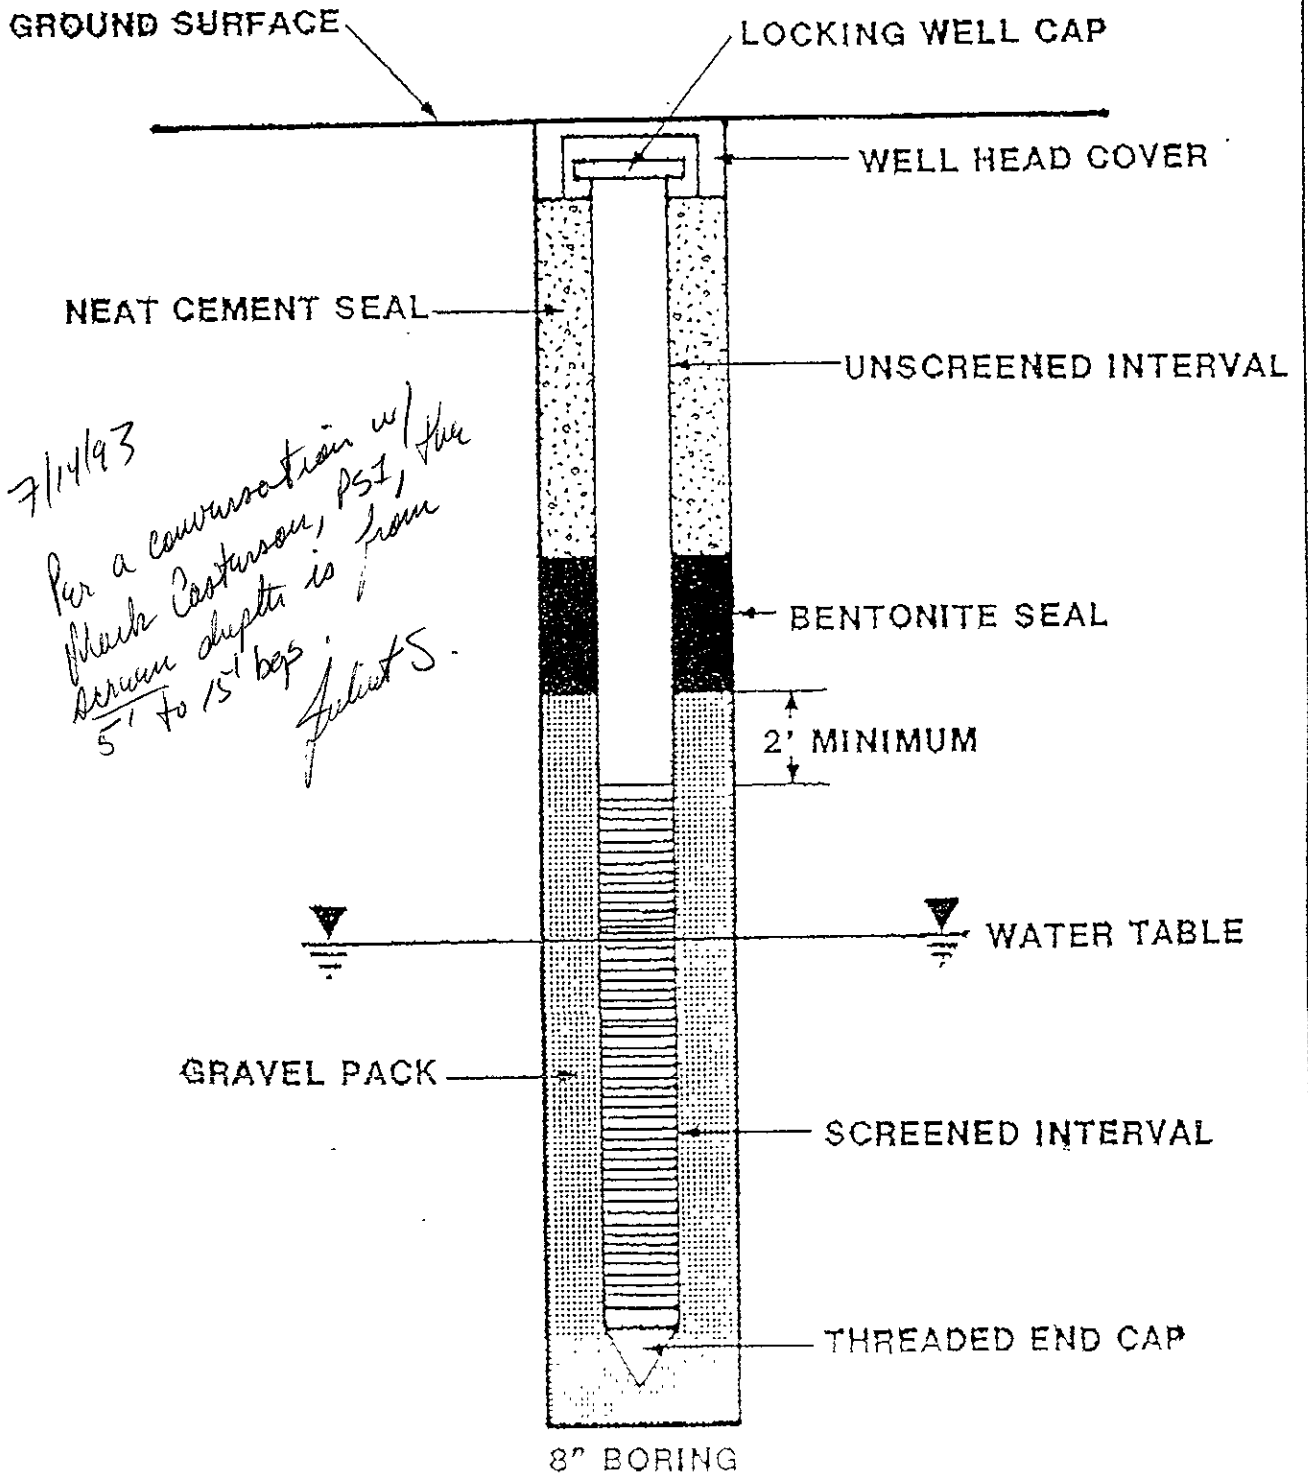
TYPICAL MONITORING WELL CONSTRUCTION DESIGN
